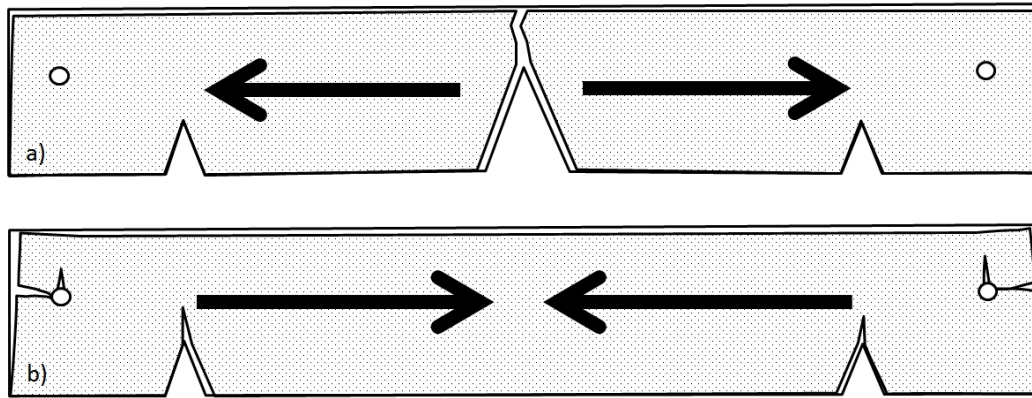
Illustration of cracking and shrinkage observed for: a) Normal shrinkage cracking mould with 64 mm bottom triangular insert at centre. b) Modified shrinkage cracking mould with no triangular insert at centre.
